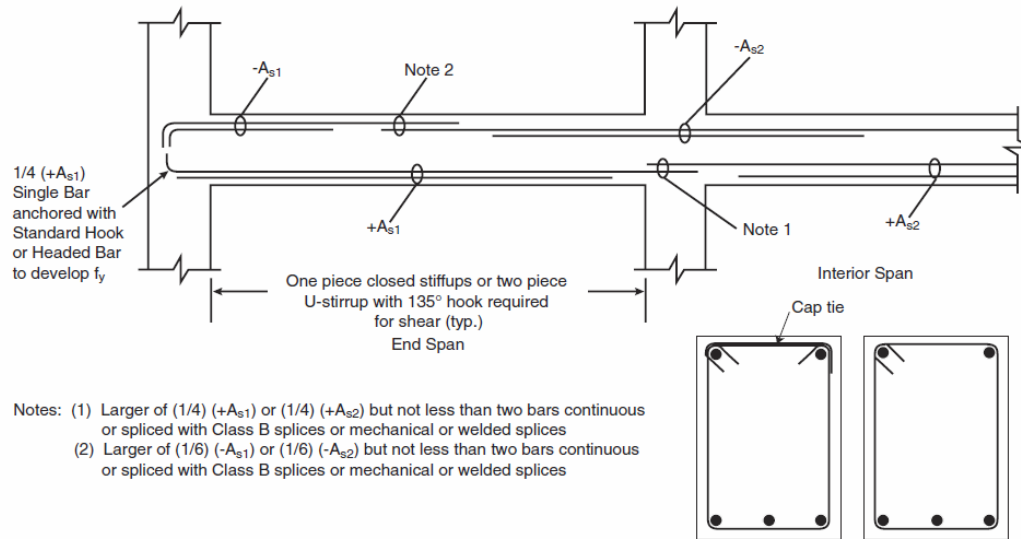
Structural integrity details for beams along the perimeter of the structure (*ACI 318-14*)
